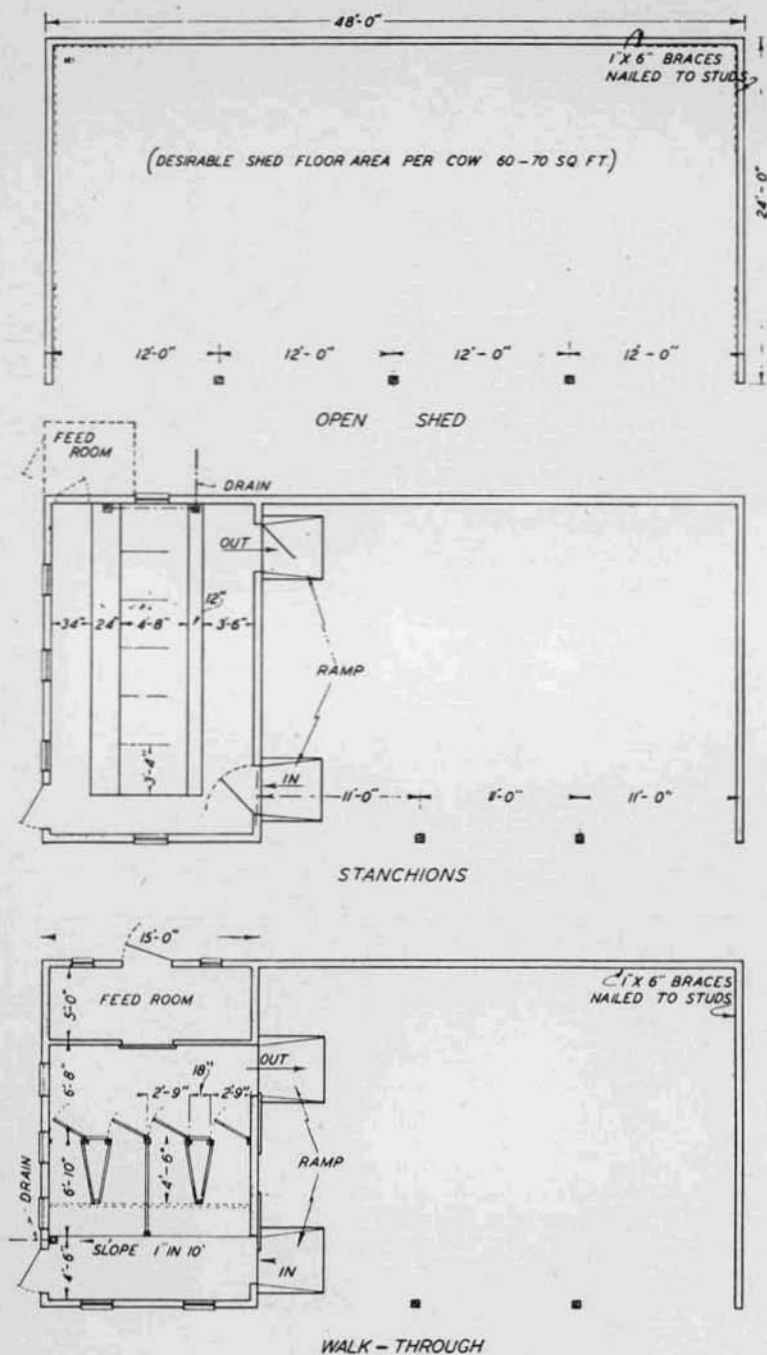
Floor plans. (Plans .721-15, .721-16A, .721-16B)
